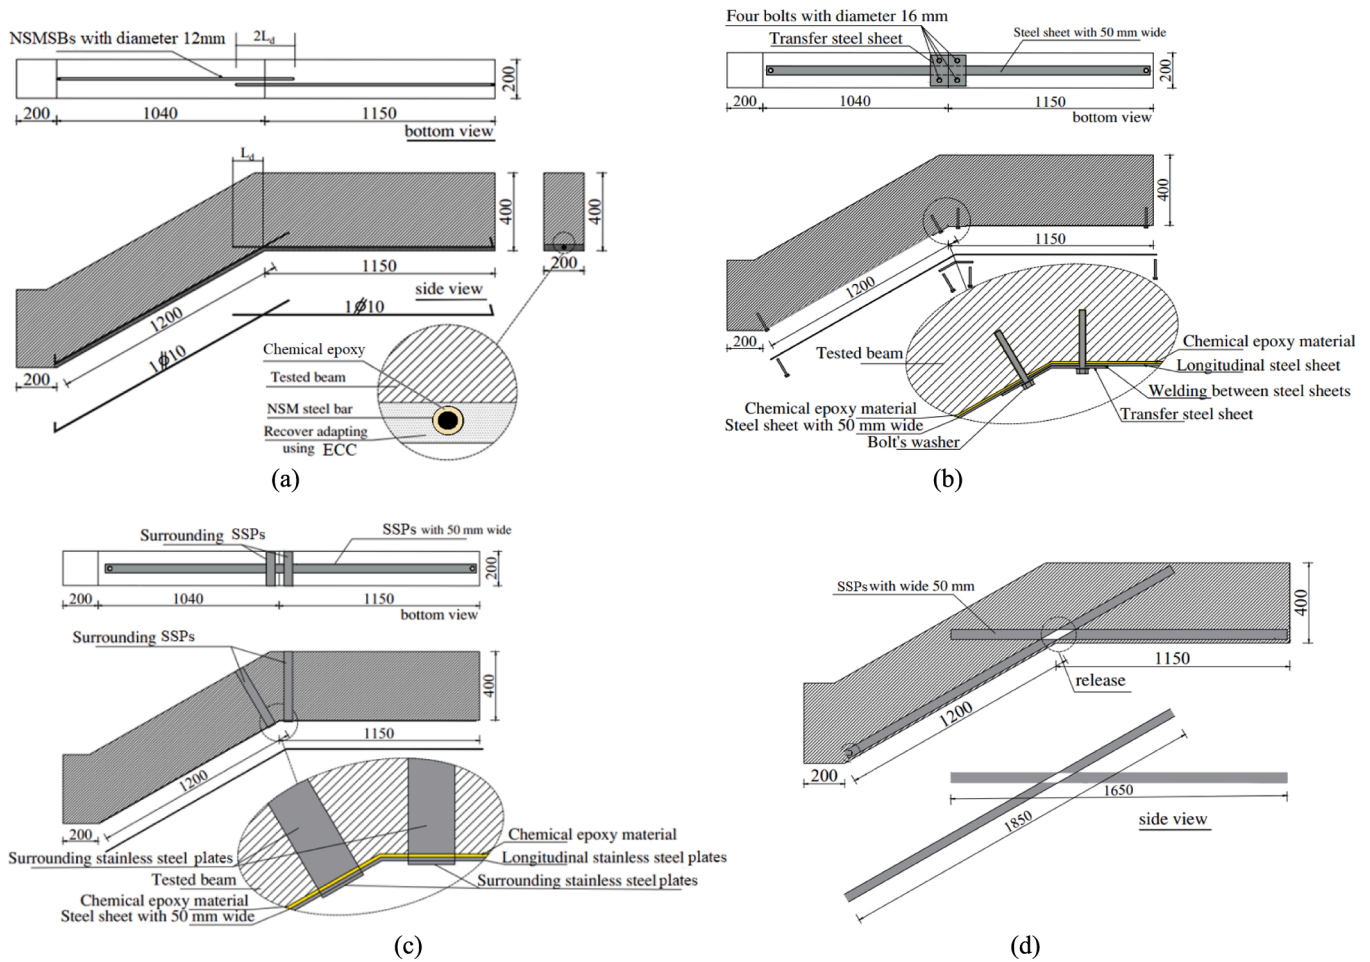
Geometric details of strengthened beams: (a) Beams B1 and B2, (b) Beam B3, (c) Beam B4, (d) Beam B5.
